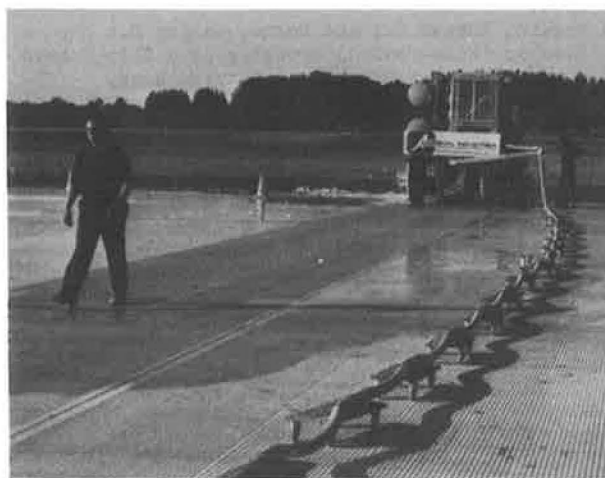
Space shuttle landing facility at KSC with pavement grooving machine (diamond blades).
